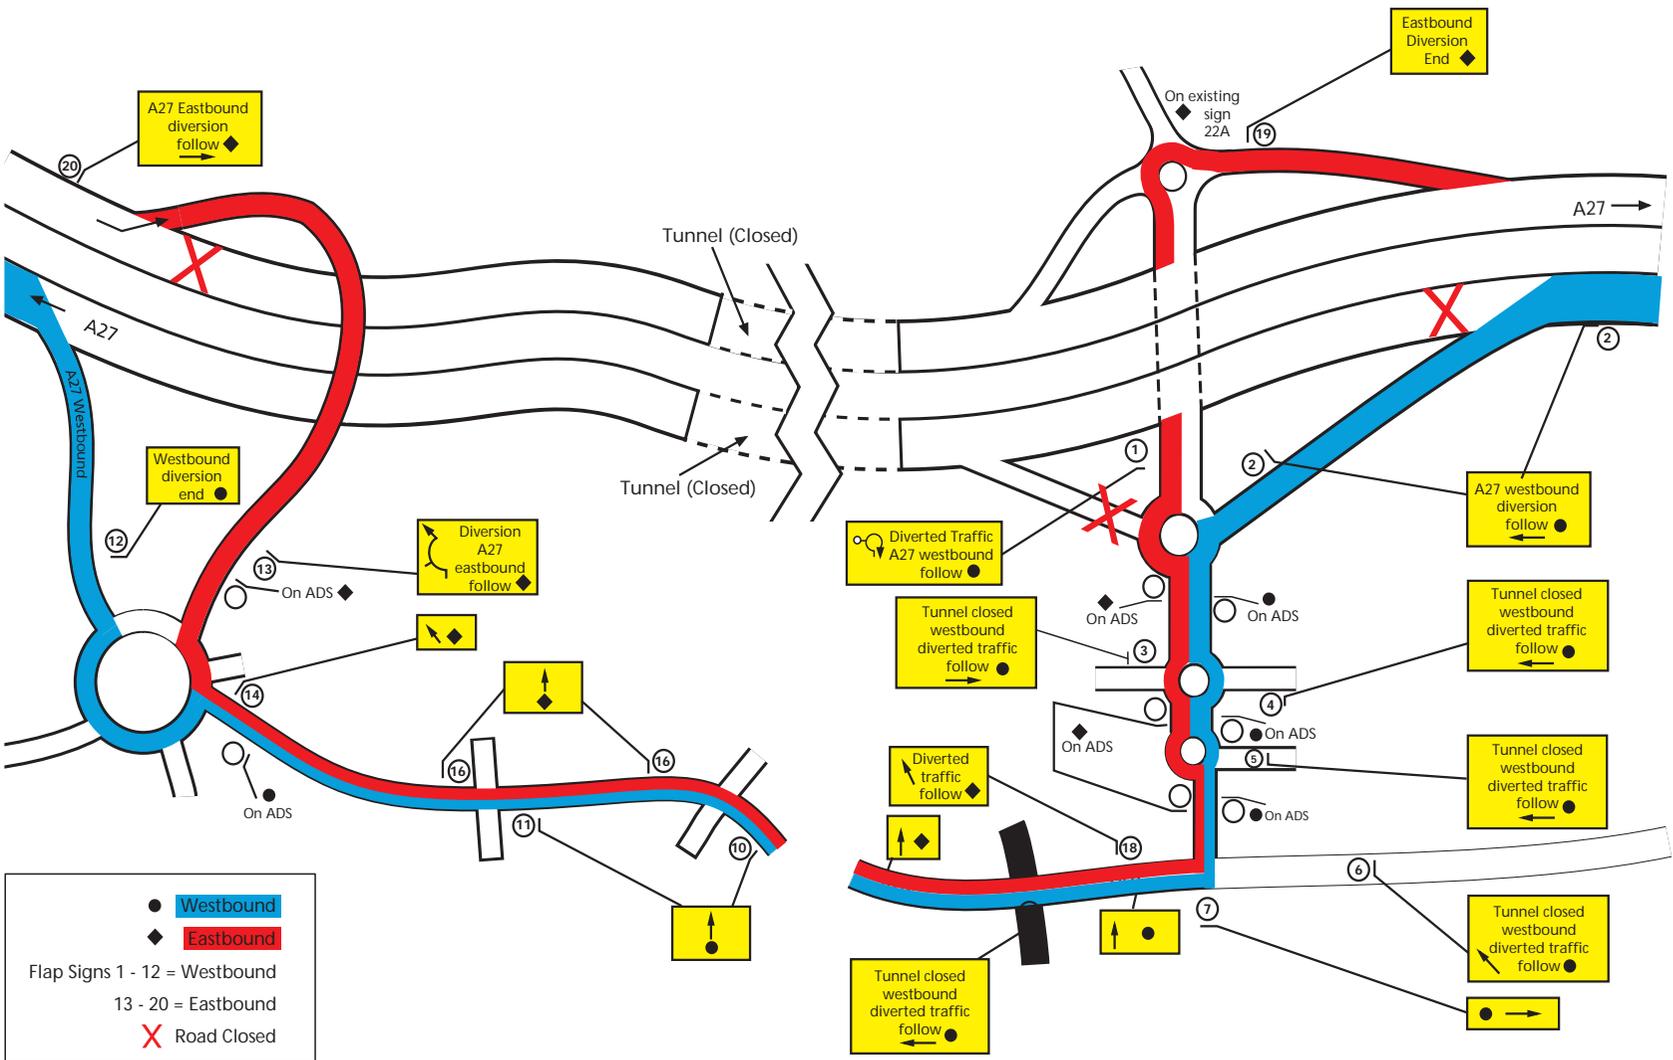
Example Tunnel Diversion Notices. Schematic Layout
